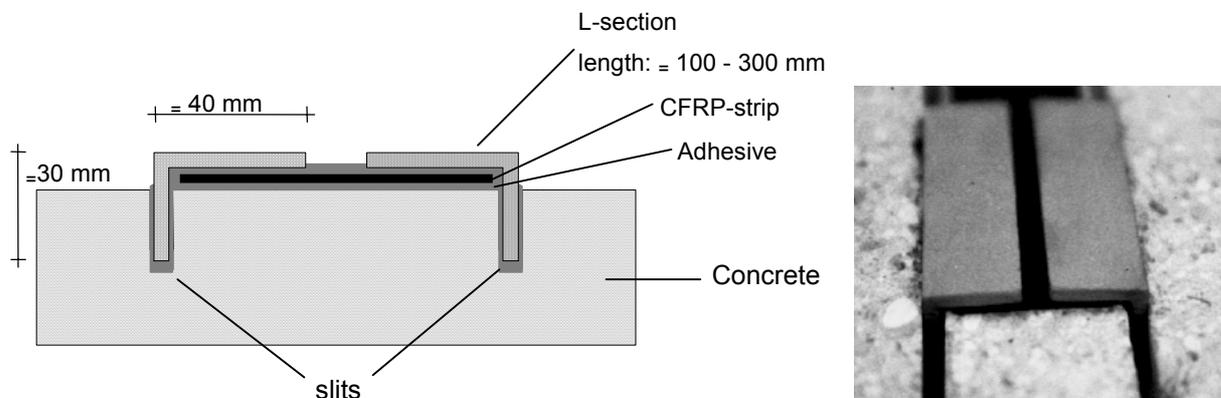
Anchorage for CFRP strips, special anchorage system (Zehetmaier 2000).
